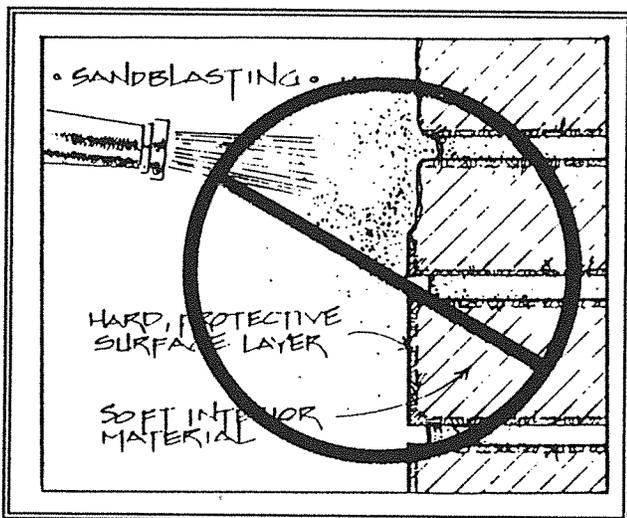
Do not sandblast masonry surfaces. It causes irreversible damage.
